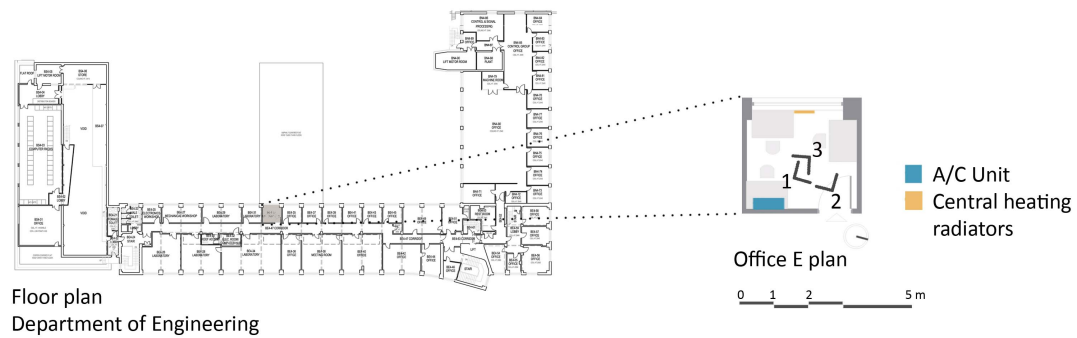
Office E floor plan and its location within the Engineering Department.
